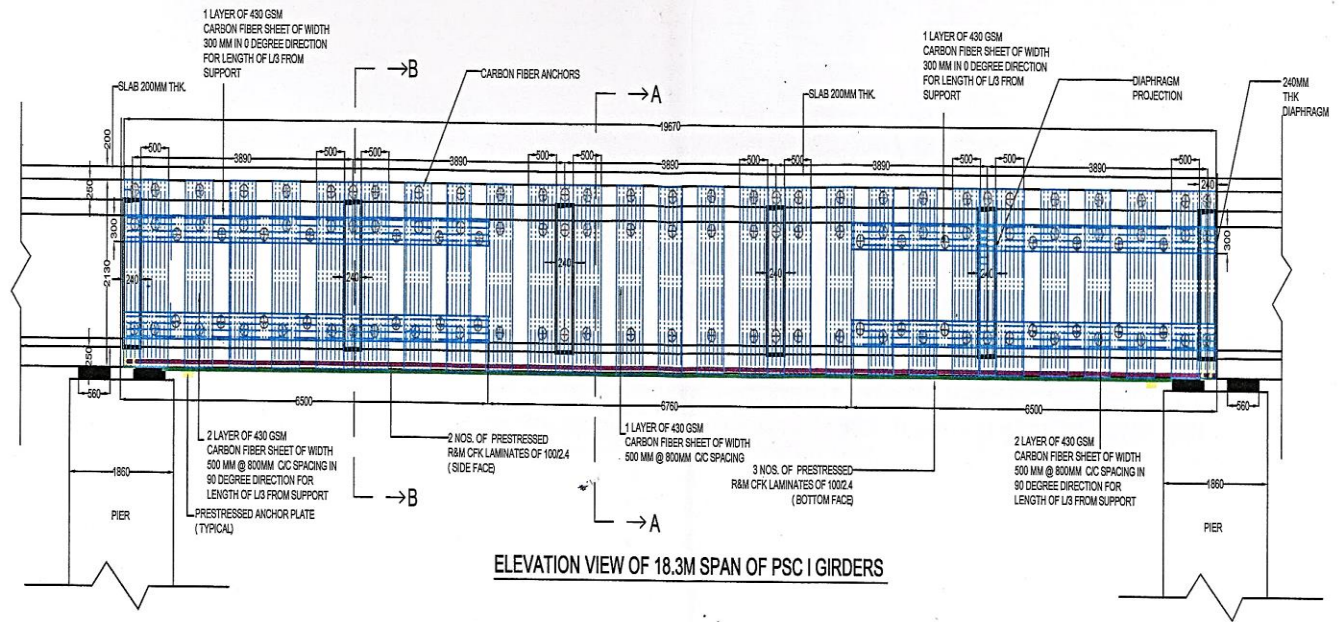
Elevation View of 18.3m Span of Ratlam Railway Bridge PSC I Girders
